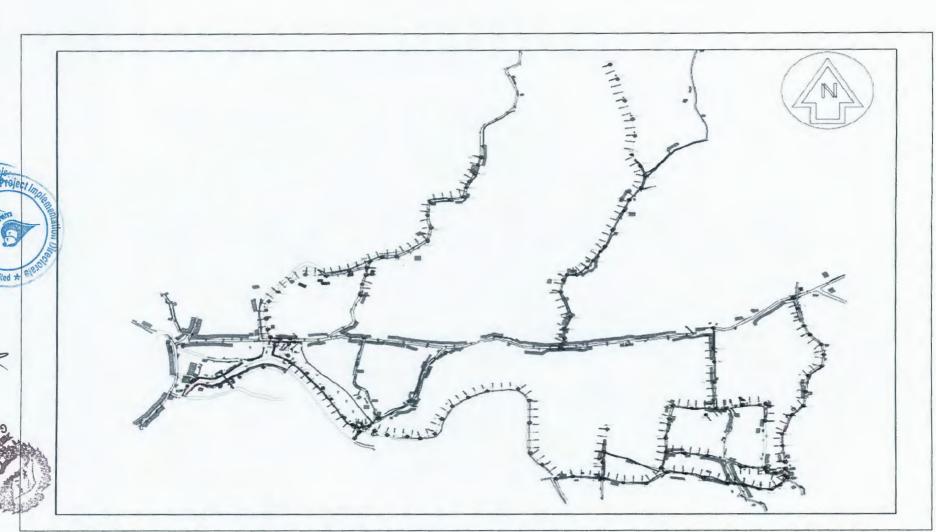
Layout Map of the Proposed Sewer Network Site
